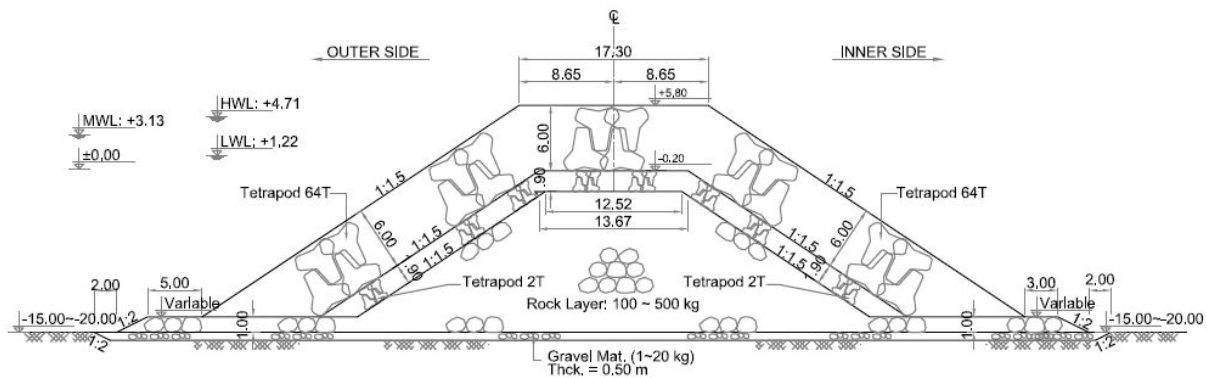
Typical Cross Section of Offshore Breakwater in Tra Vinh
